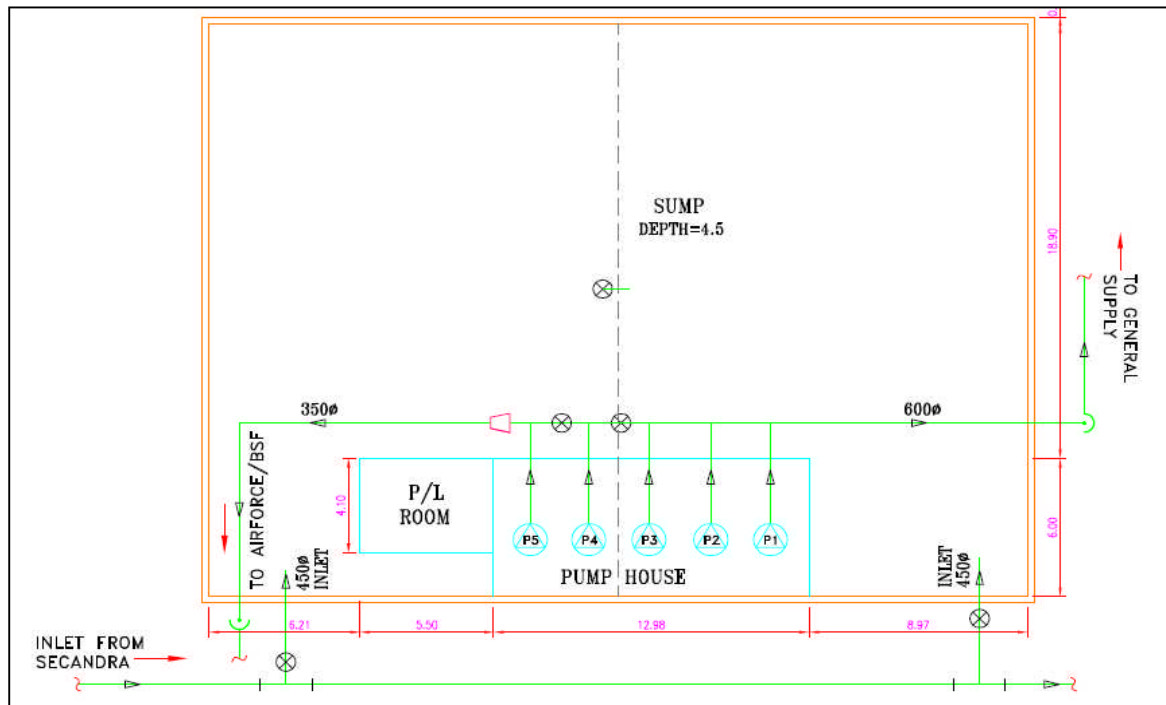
Plant Layout for Shahganj Phase-2 ZPS
